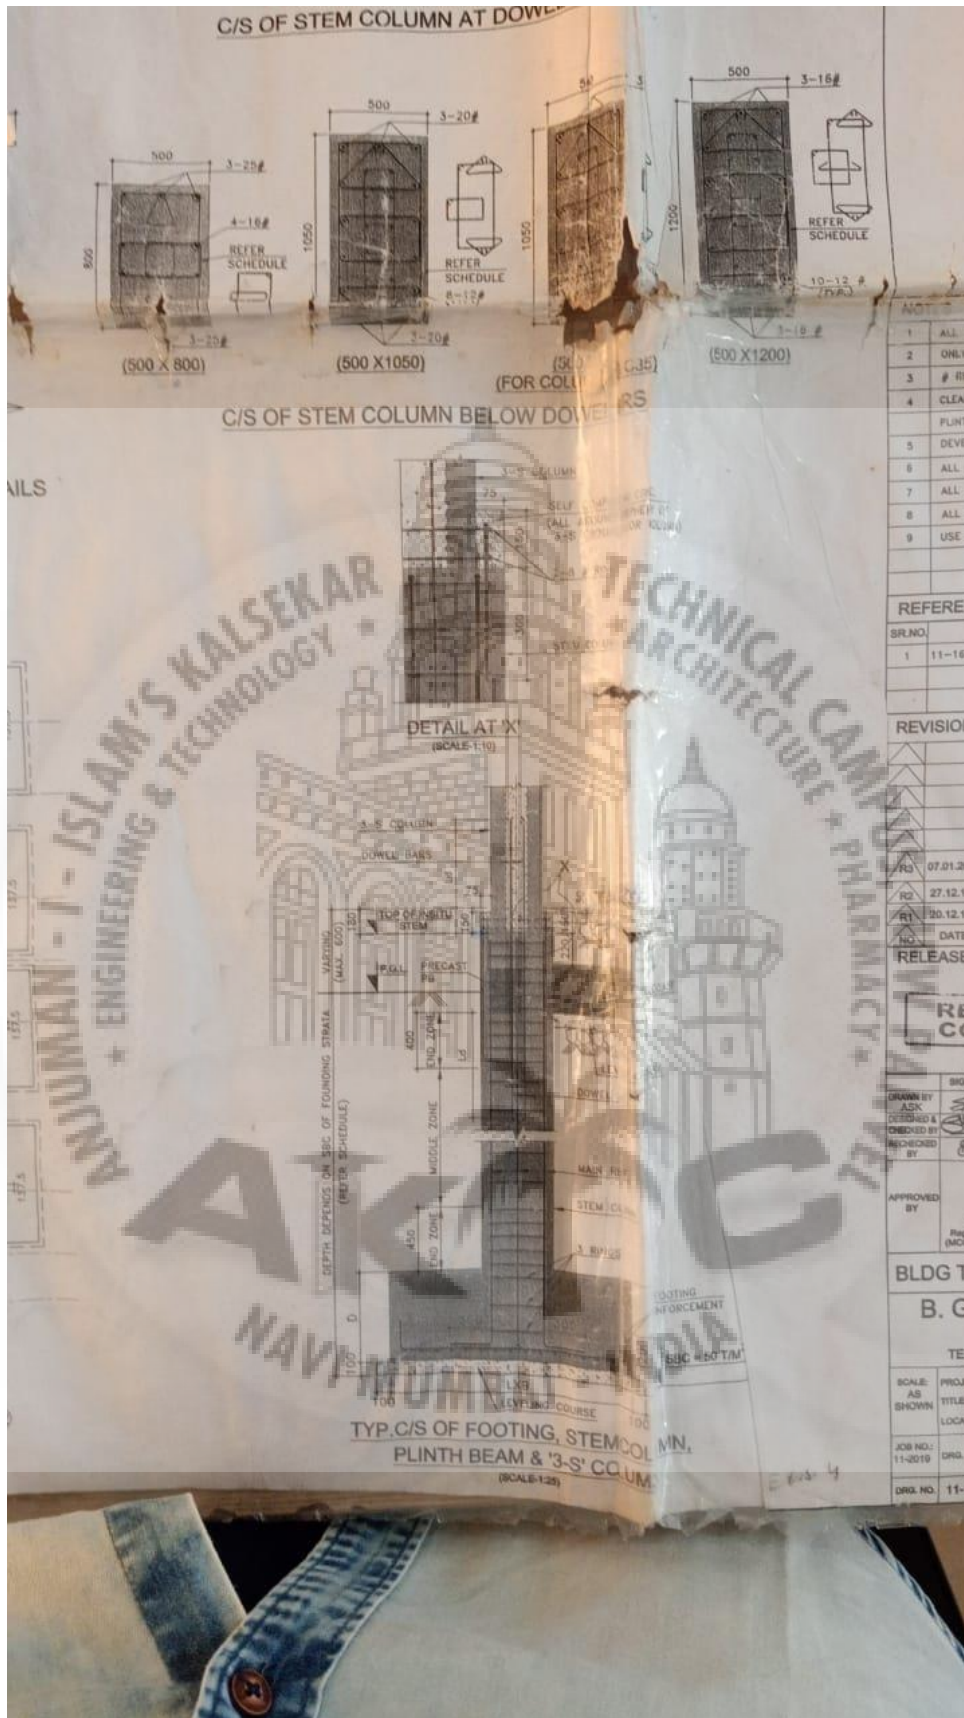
(j) : Cross Section Of Footing (Sector 36-1)
